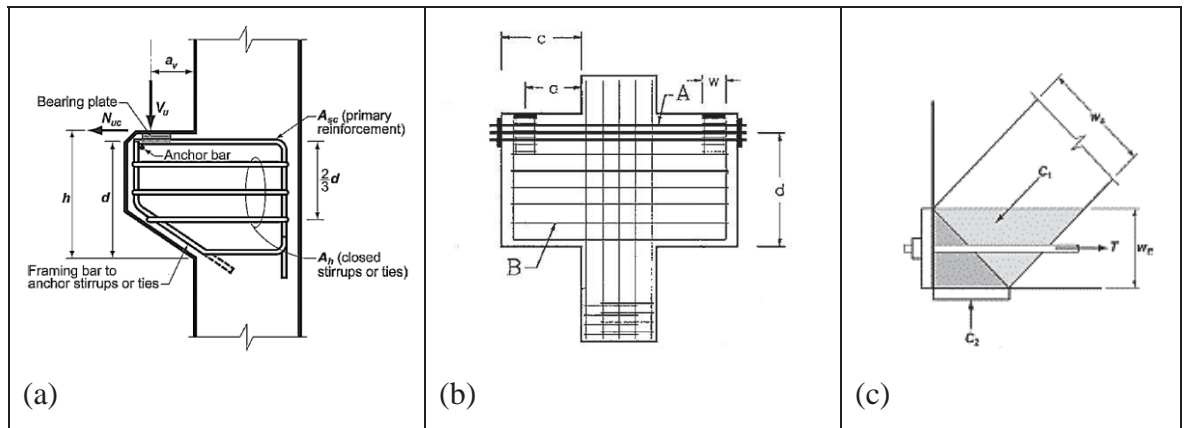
Anchorage of main reinforcement; (a) Anchor bar, (ACI 318M, 2014), (b) Mechanical anchoring steel plate, (Stephen, et al., 1996), (c) Tensile force anchored by a plate, (ACI 318M-14, R23.2.6).
